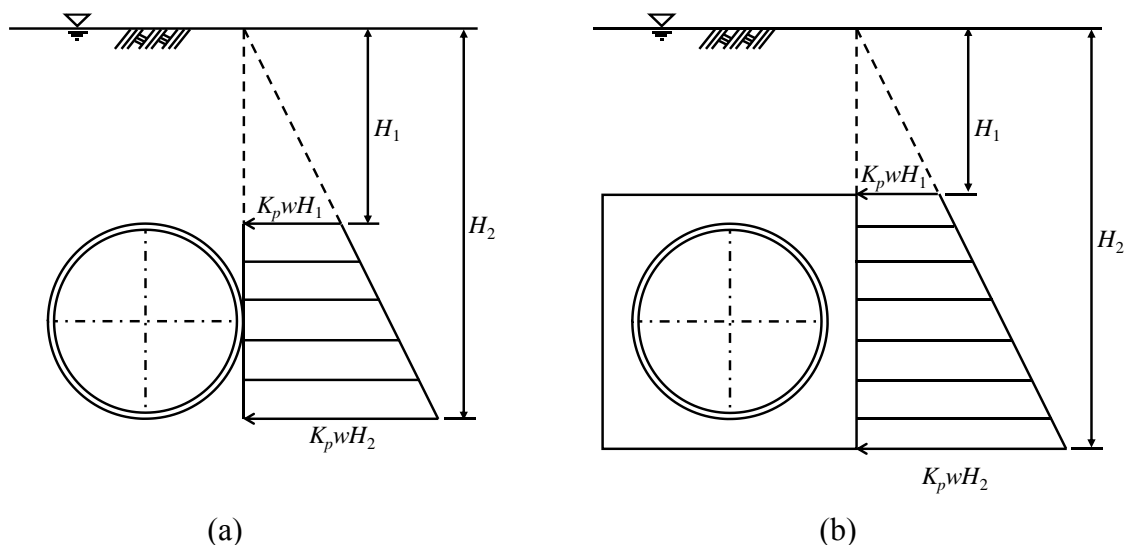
Passive earth pressure acting on (a) pipe and (b) concrete block
